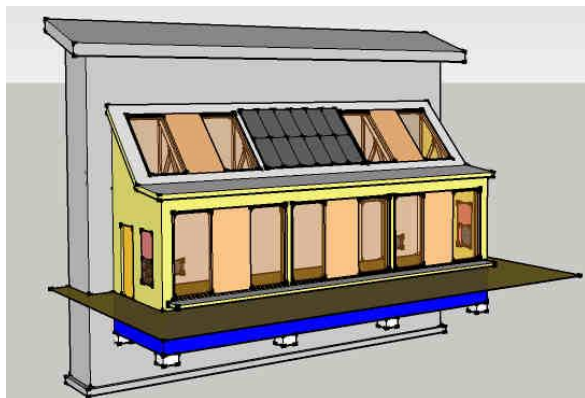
SSE elevation of an attached solar greenhouse, nominal dimensions of 36 feet wide by 12 feet deep. Note earth coupling with heavy perimeter insulation to supply mass, three Generation 2 Shutters on the south side; two on the roof at 45 degrees. Light shelves in front of the vertical glazing and a white roof enhance solar gain both to growing spaces on the interior and onto the PV or solar thermal array.
